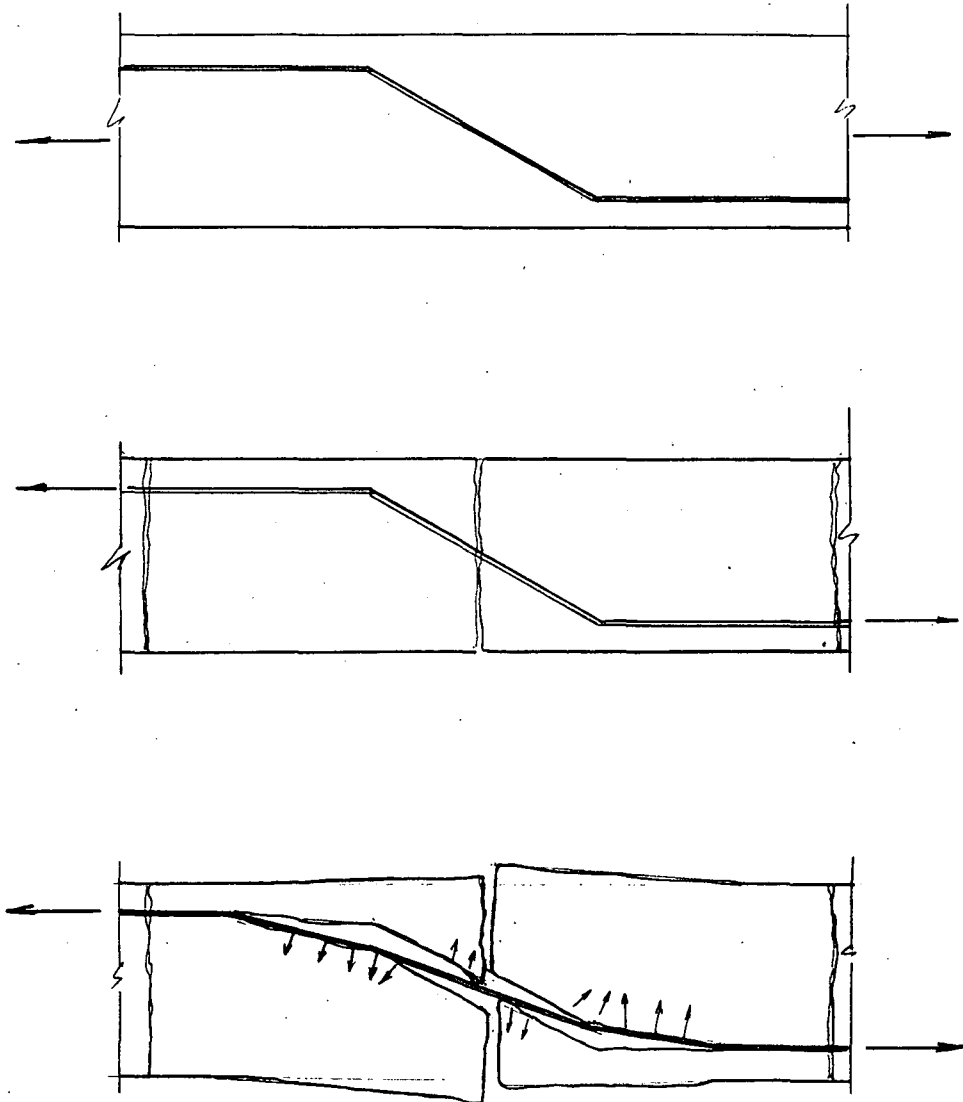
The reinforcement with continuative bent bars under in-plane load
